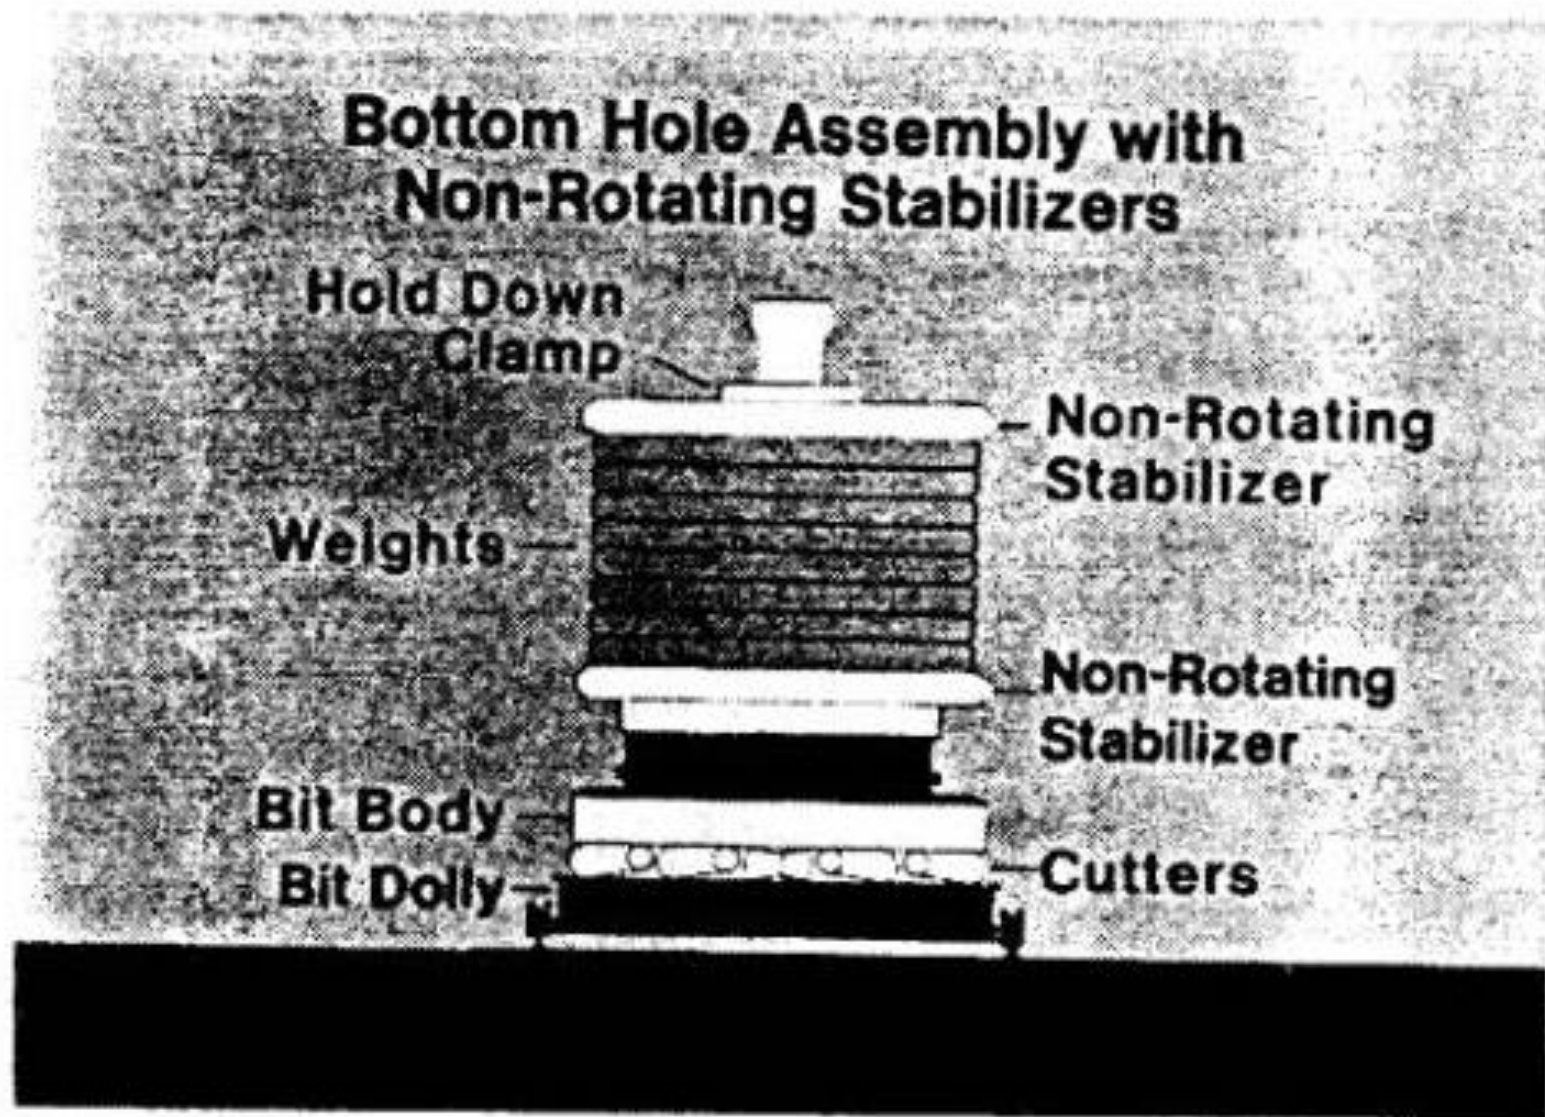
14-ft (4.3-m) diameter bottom-hole assembly.
